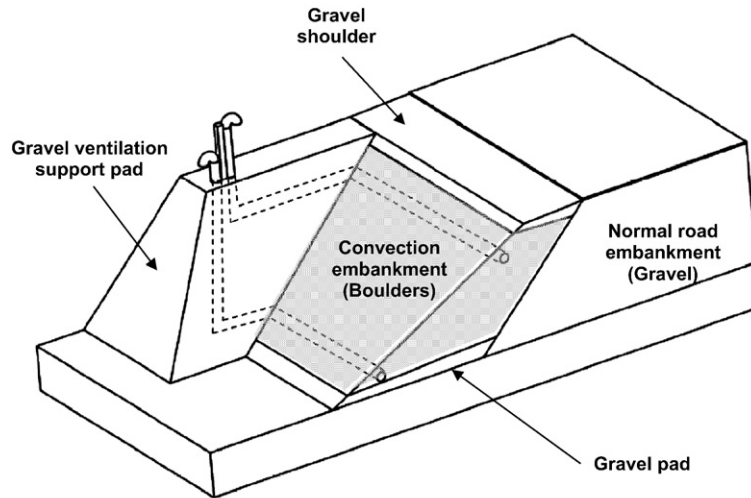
Possible construction of an air convection embankment with air intakes in the shoulder of a road embankment.
